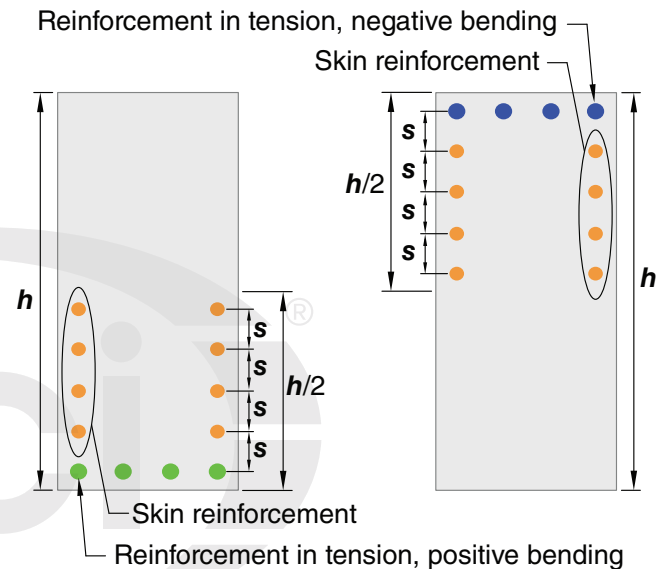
Skin reinforcement for beams and joists with $h > 36 \text{ in.}$
